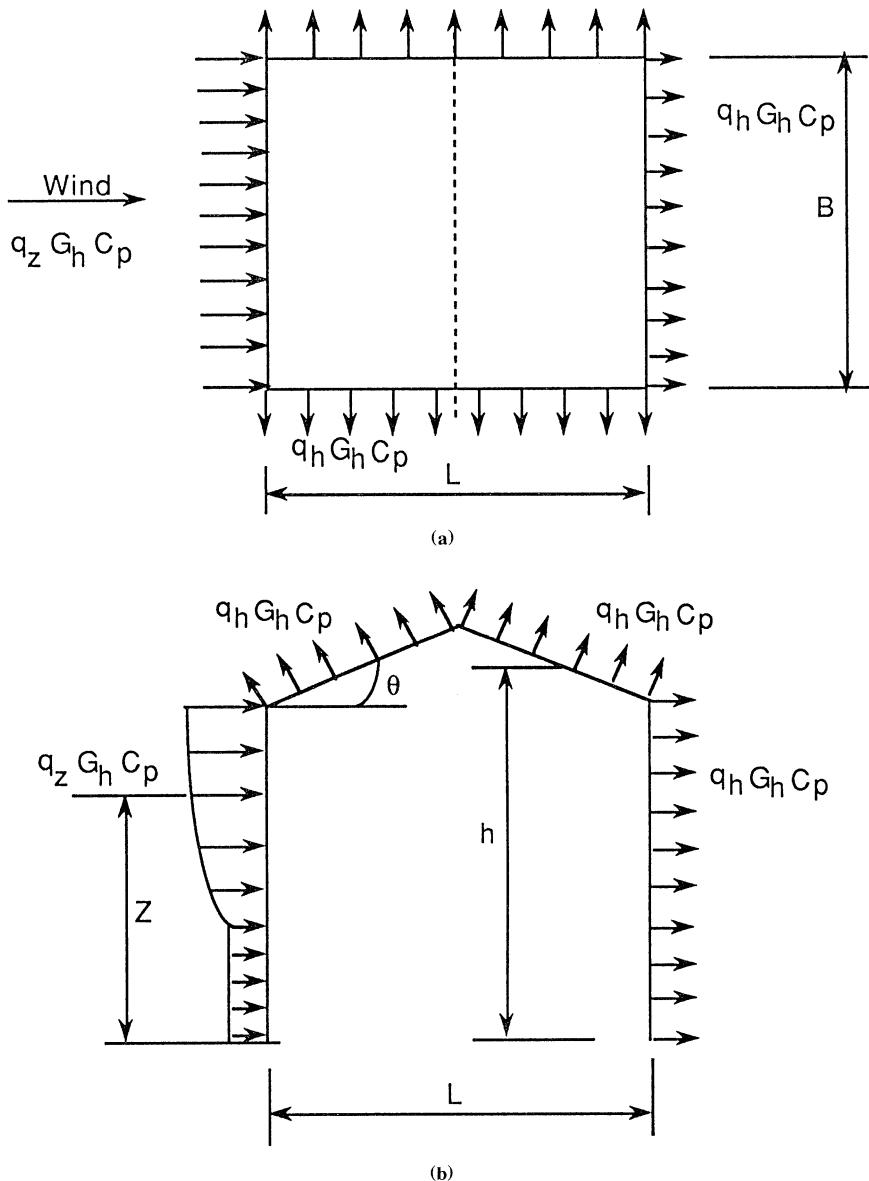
Wind drag coefficients for ordinary buildings. (a) Plan. (b) Elevation.
